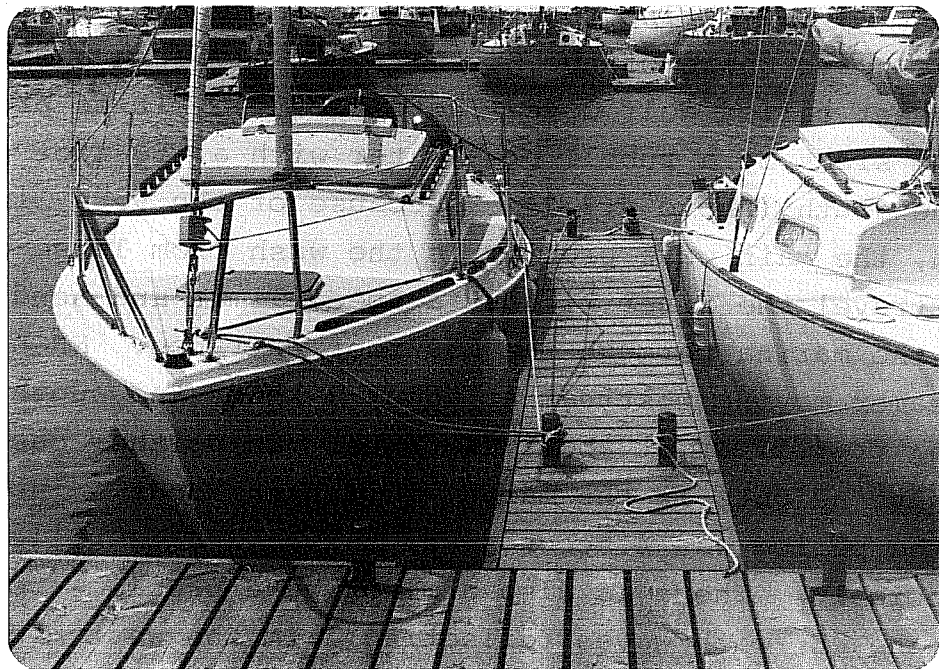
New rigid steel floats with wooden deck at Port Credit Harbour.
